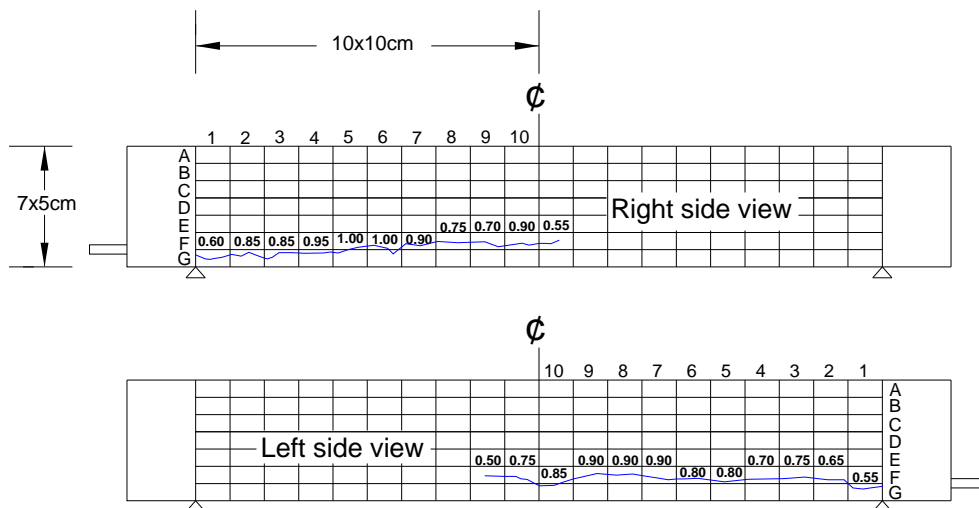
Corrosion crack pattern for specimen A-C5-U-3B at the end of the second corrosion phase (60 days)
